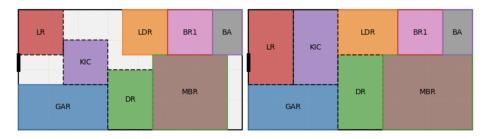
Filling blank areas in the floor plan. The left one is the original final floor plan, and the right one is the floor plan after filling blank areas.
